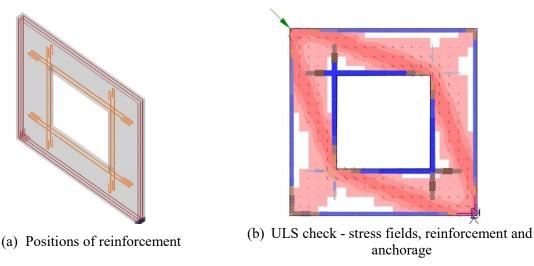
Wall panel with an opening in IDEA StatiCa [2]
